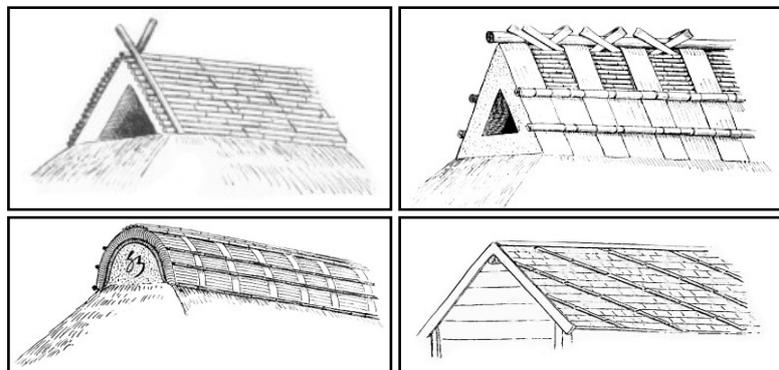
Various roof styles using bamboo. (*upper left*) Crest of thatched roof. (*lower left*) Bamboo-ridge of thatched roof. (*upper right*) Crest of thatched roof with a bamboo yoke. (*lower right*) Bamboo fixing shingles.
